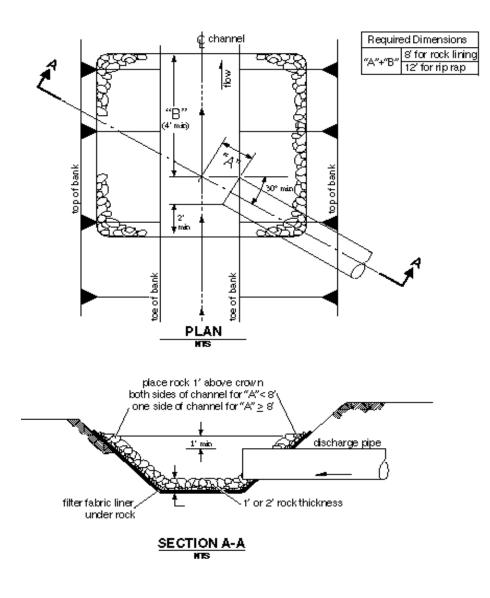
Pipe/Culvert Outfall Discharge Protection
